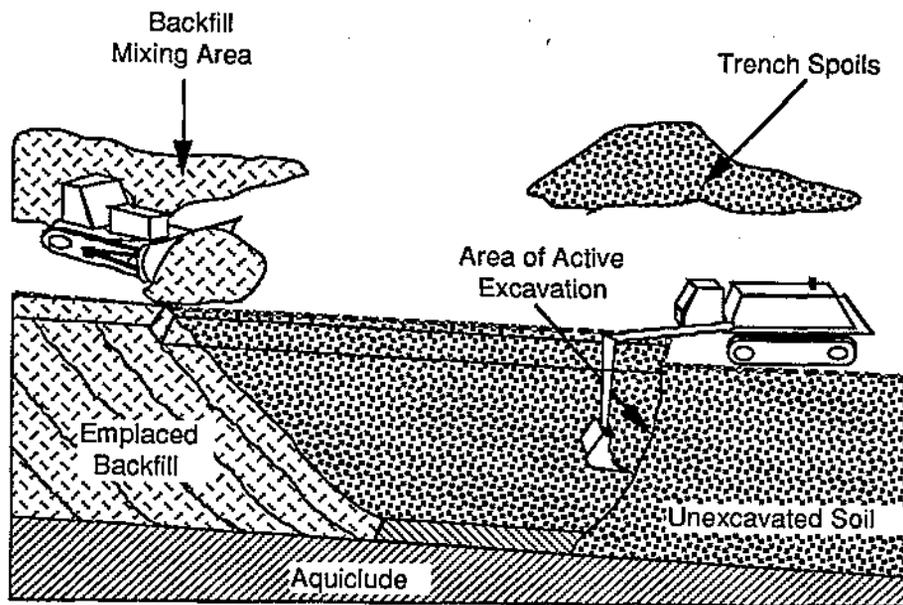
Diagram of Construction Process for Soil-Bentonite-Backfilled Slurry Trench Cutoff Wall.
